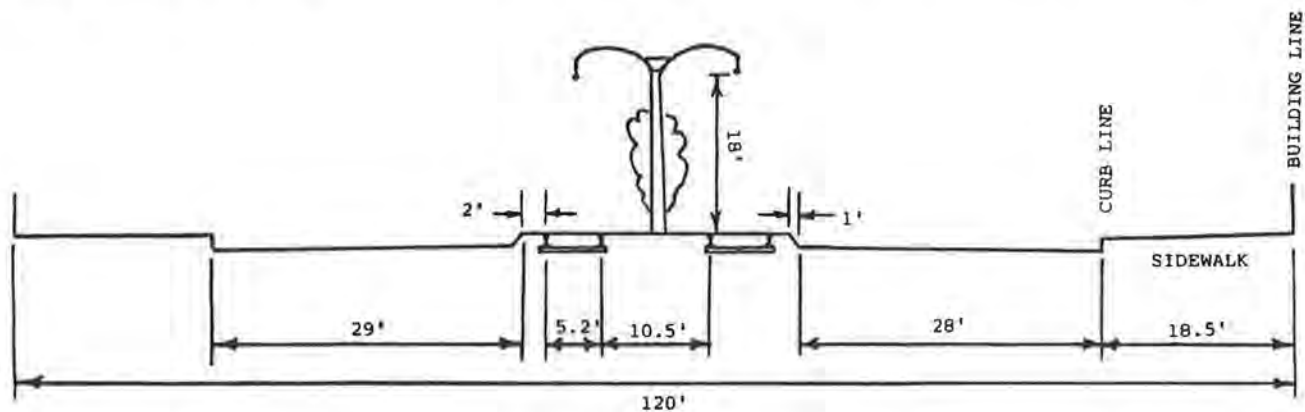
Cross section of Allegheny Avenue light rail project.
